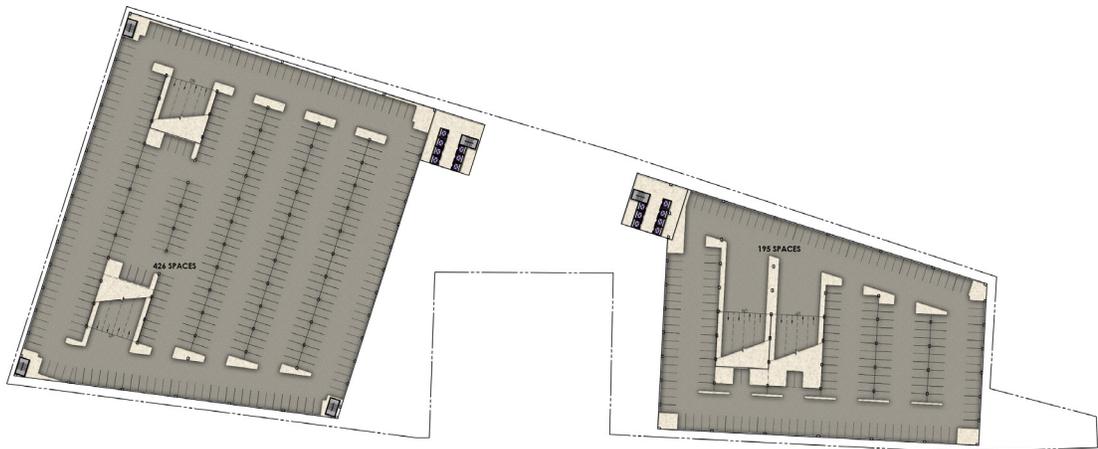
a-39 Alternate Parking Structure Plan - Garage Levels 4, 7 Plan
